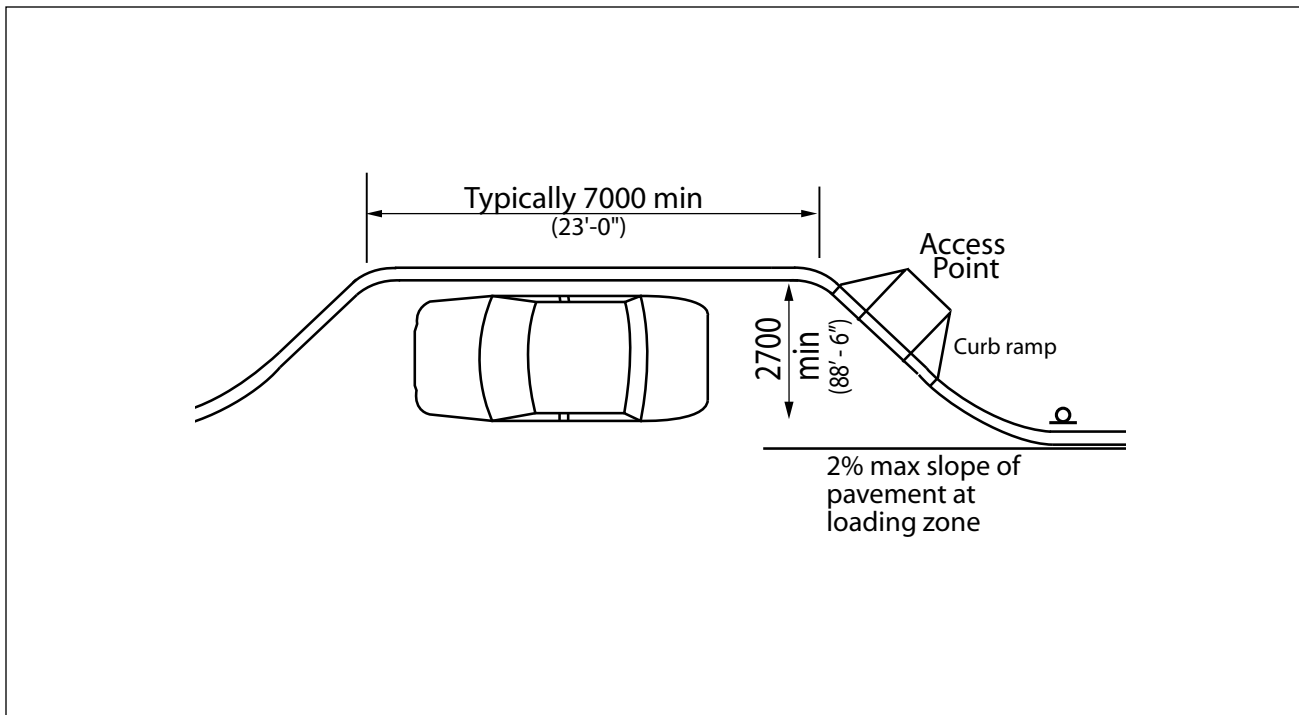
Off-Street Lay-by Passenger Loading Zone
